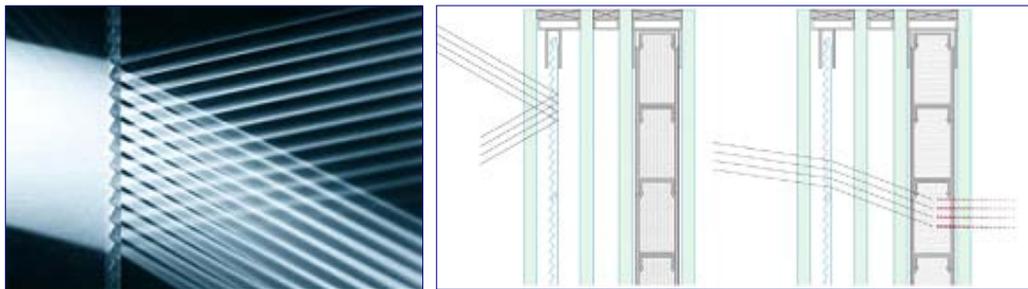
Domat Ems building - Particular of the south facing solar wall
